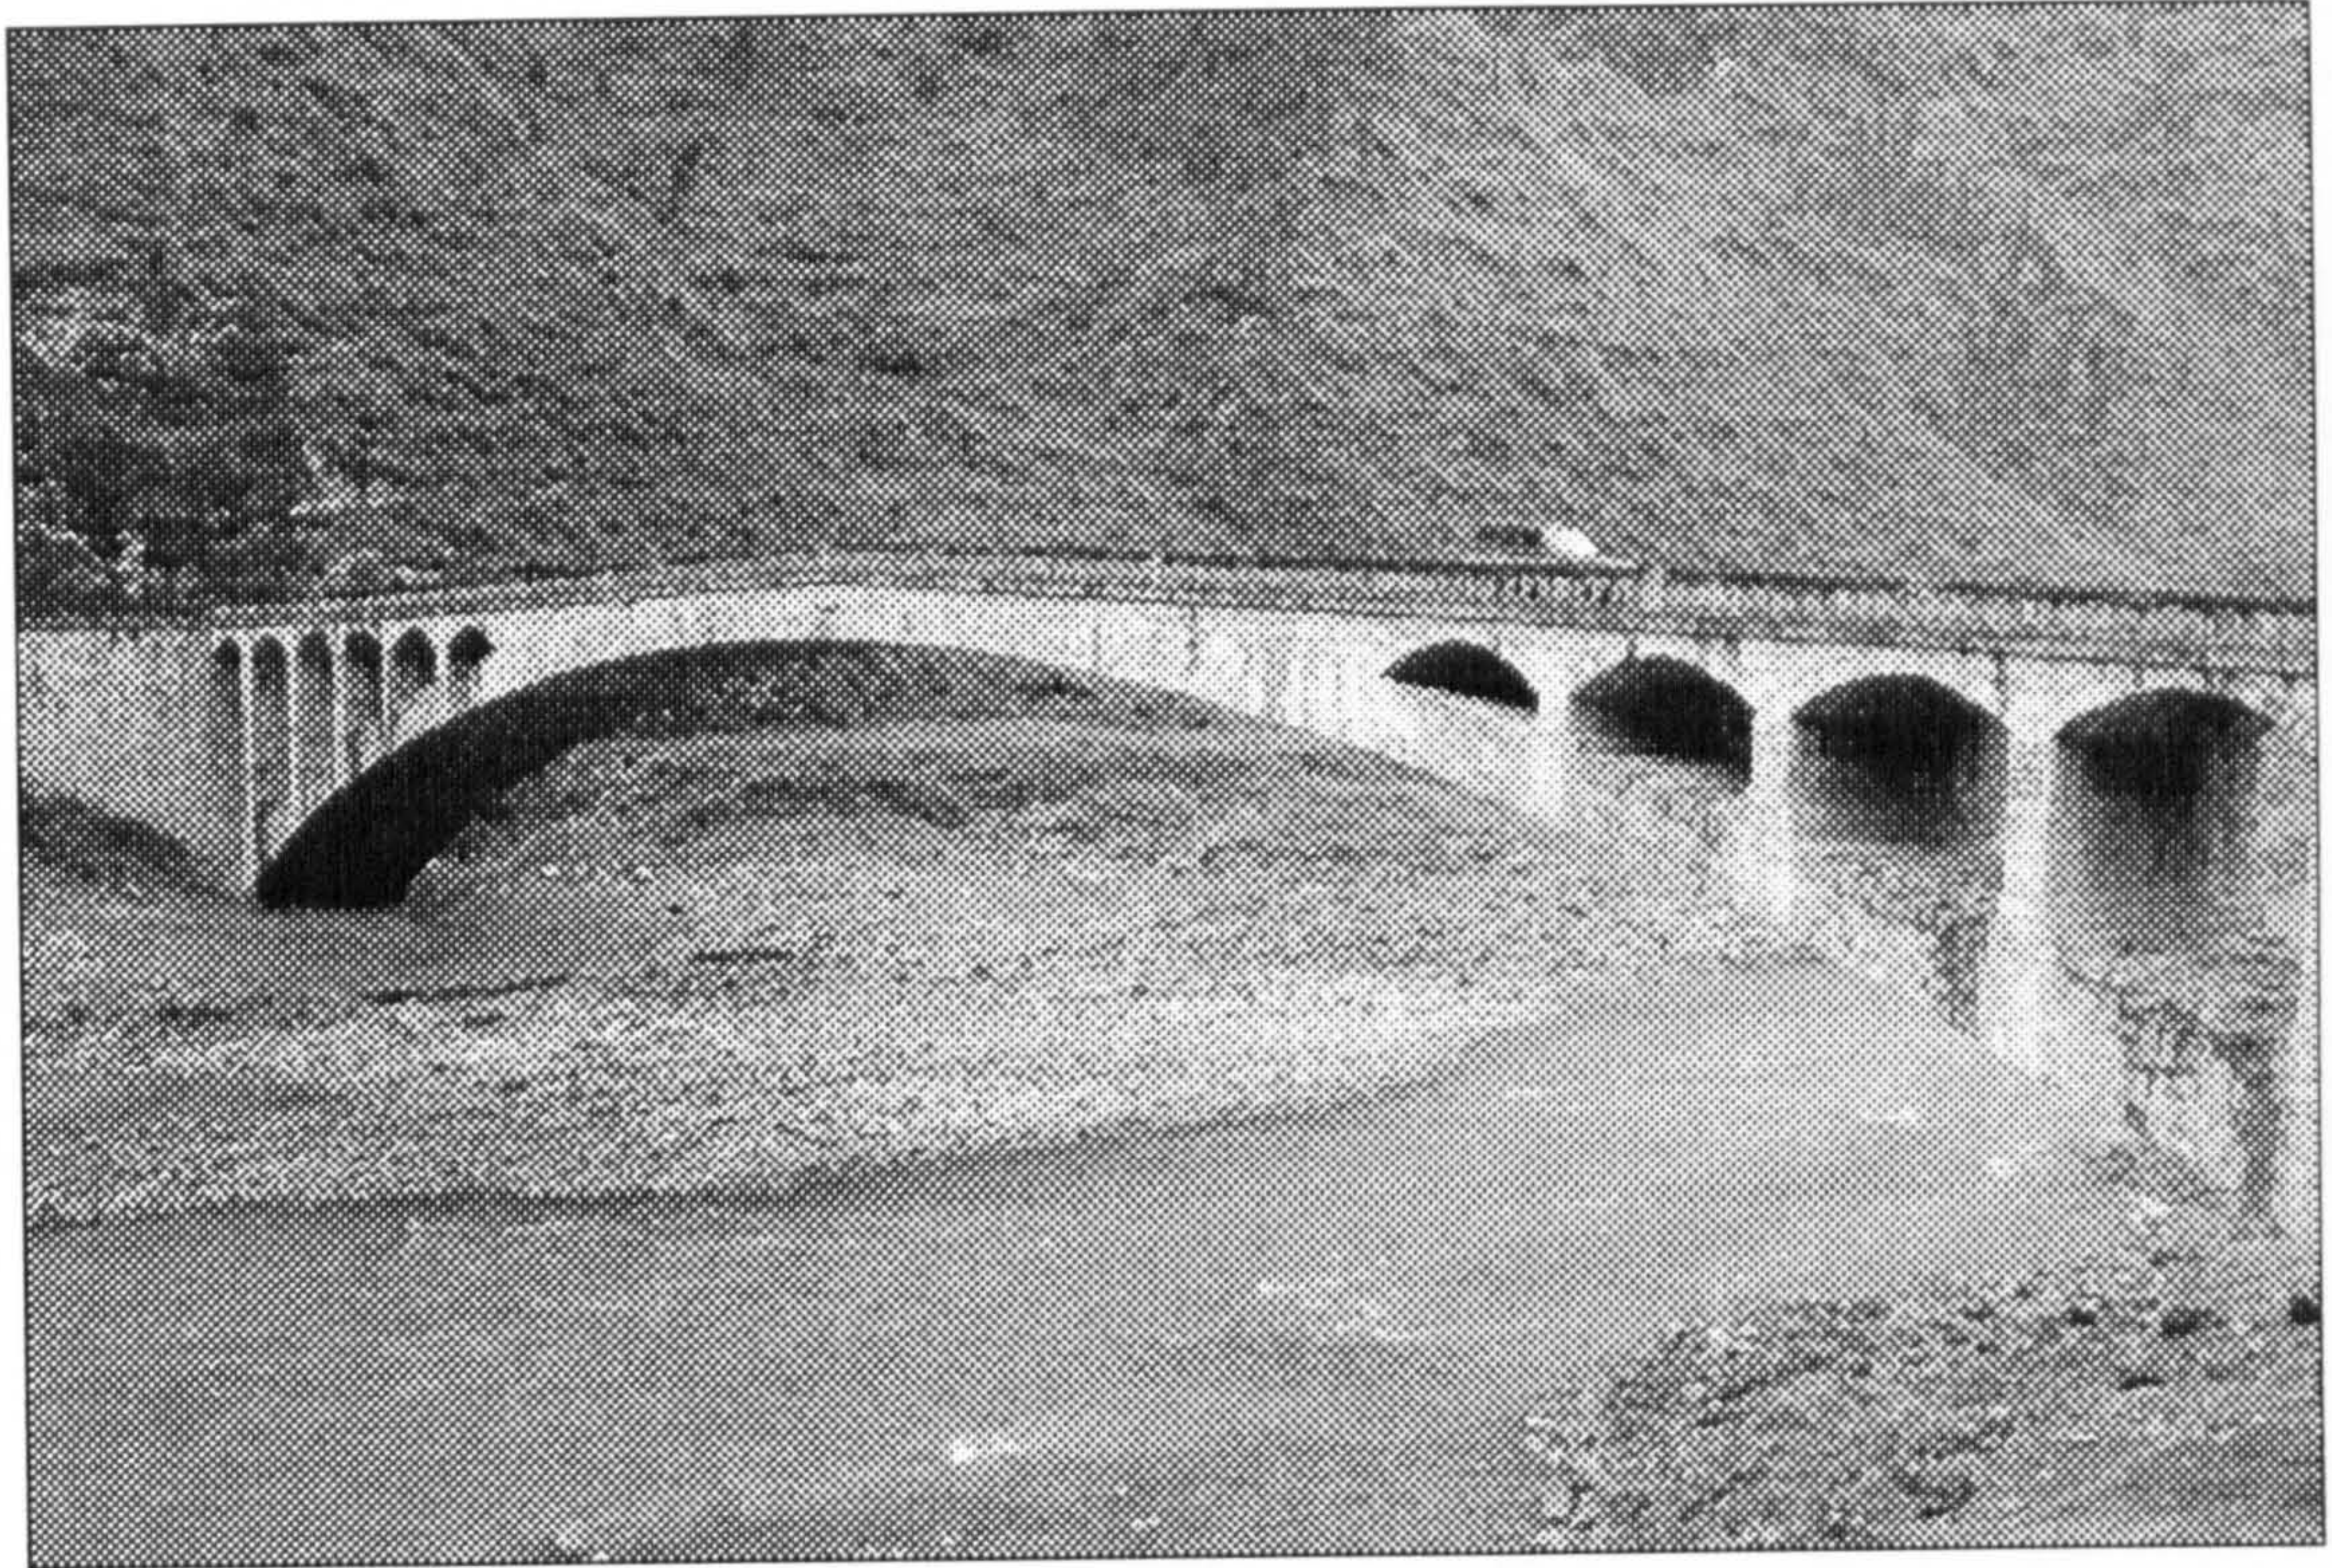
The world's longest masonry arch bridge, Juxigou bridge, China (After LU, 1992)
